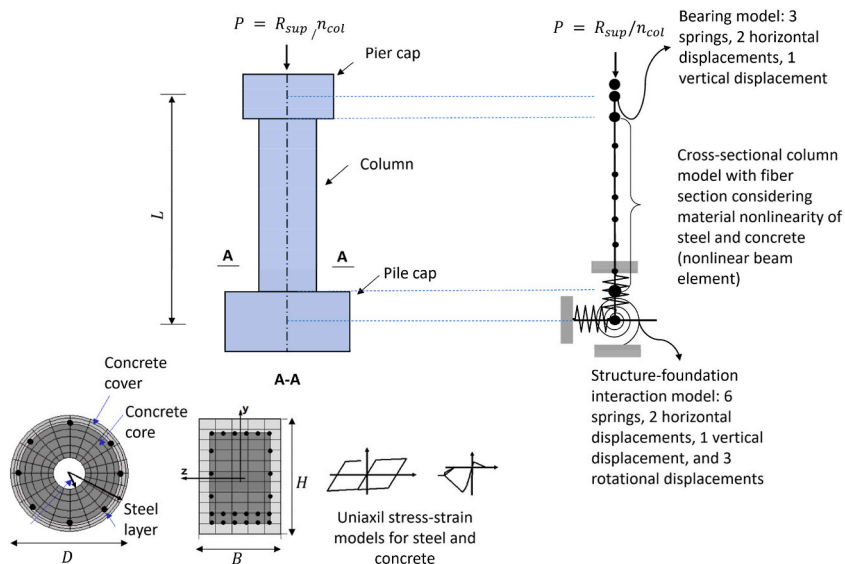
Modeling bridge abutment structure considering the influence of bridge bearings and foundations (unit mm).
